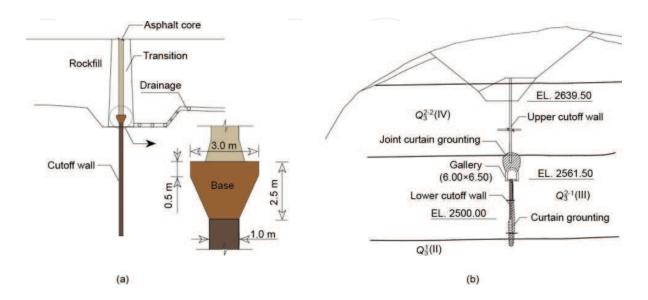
Connection techniques in the Yele ACRD. (a) Section A-A. (b) Section B-B.
